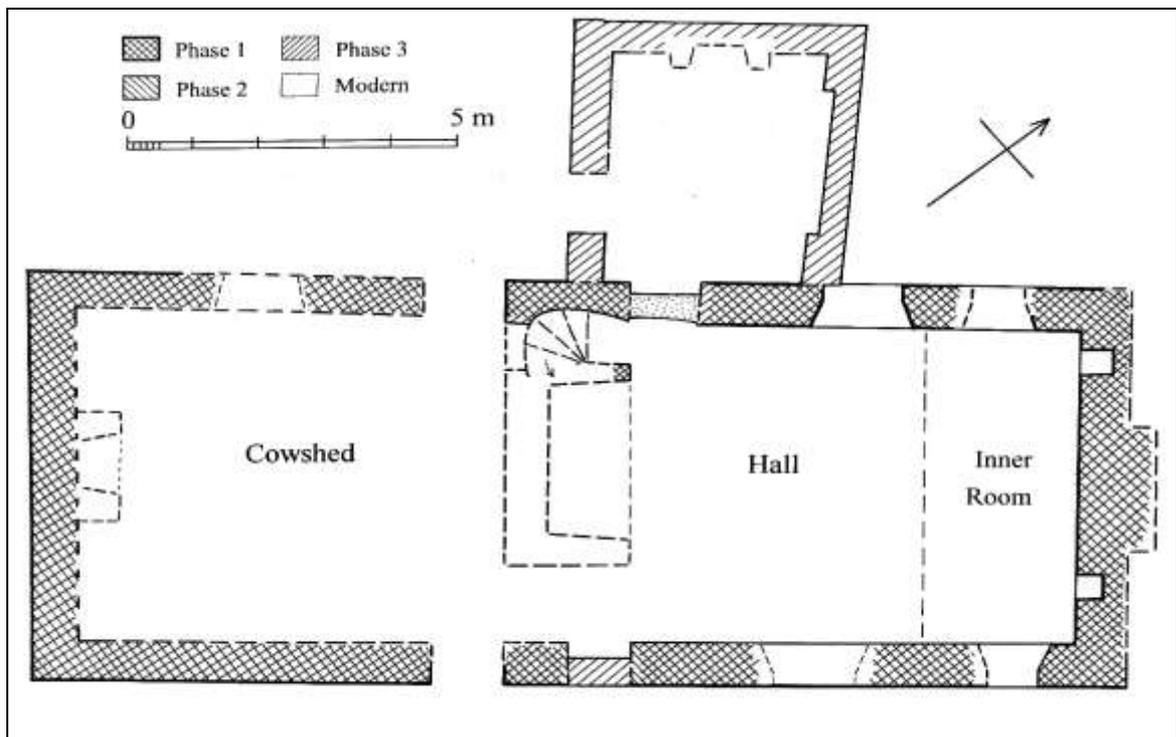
Plan of the layout and development of Cwmbyr Uchaf longhouse. Phase one may have started as early as 1600 (© 2020 Paul R Davis)
